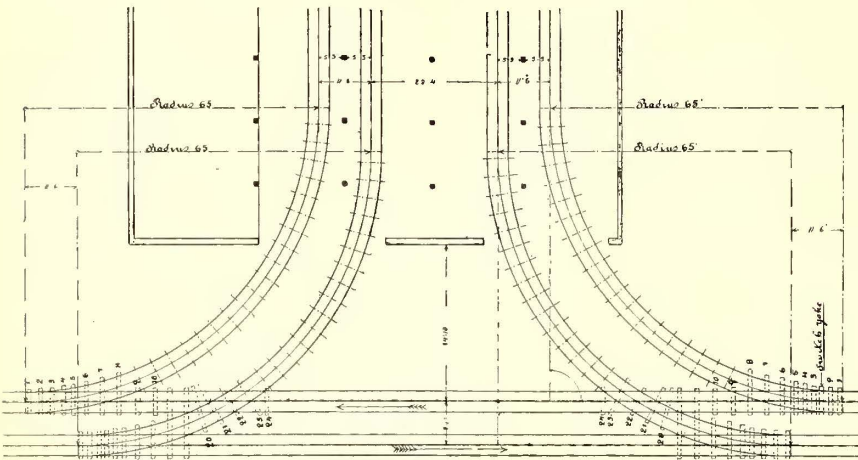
OLD PLAN OF COTTAGE GROVE AVENUE CAR HOUSE—CHICAGO CITY RAILWAY.
